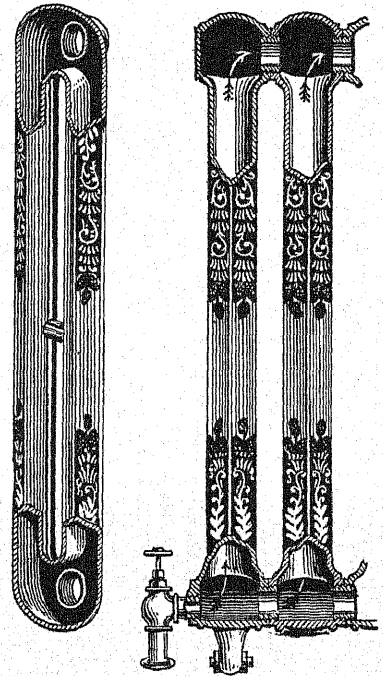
Section and View of parts of the "Safford" Radiator for Hot Water.
